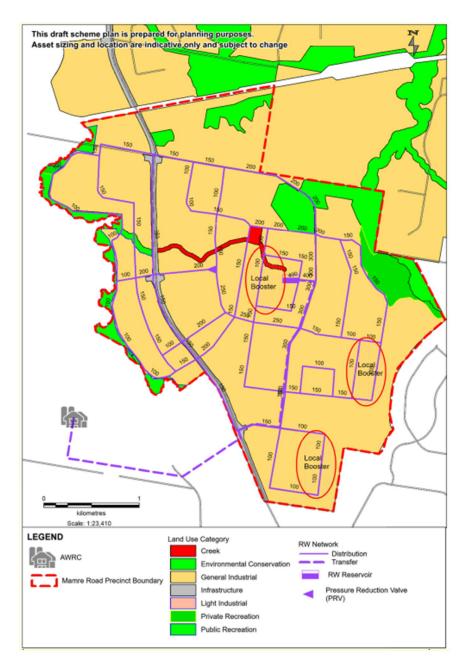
Draft Mamre Road Recycled Water Scheme Plan
